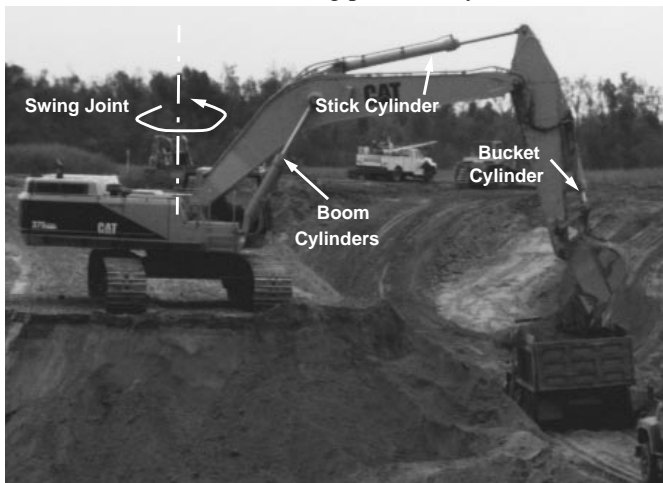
A typical excavating machine (Hydraulic Excavator)
